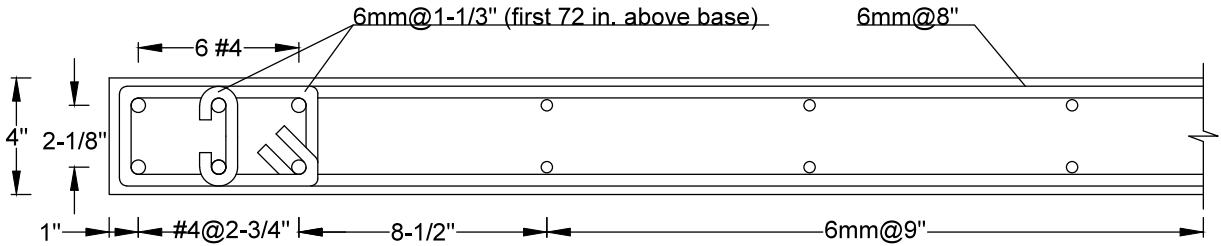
R2 specimen reinforcing details (1 in. = 25.4 mm).
